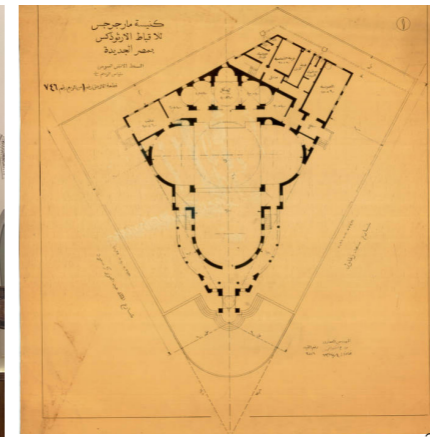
Floorplan of St. George church.<sup>37</sup>
